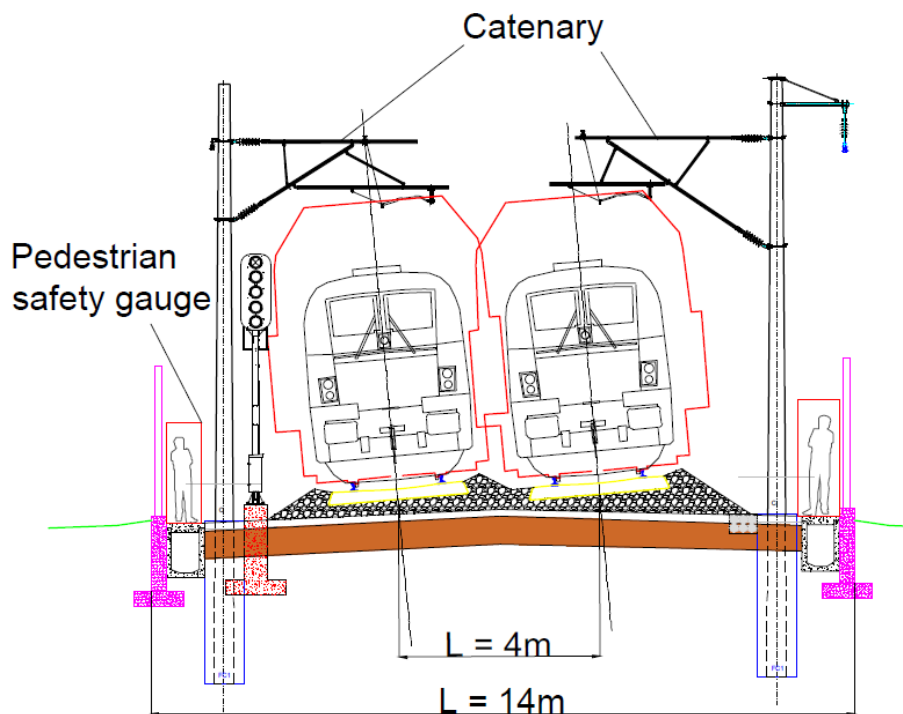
Typical cross section elevated and straight, for Heavy Train
